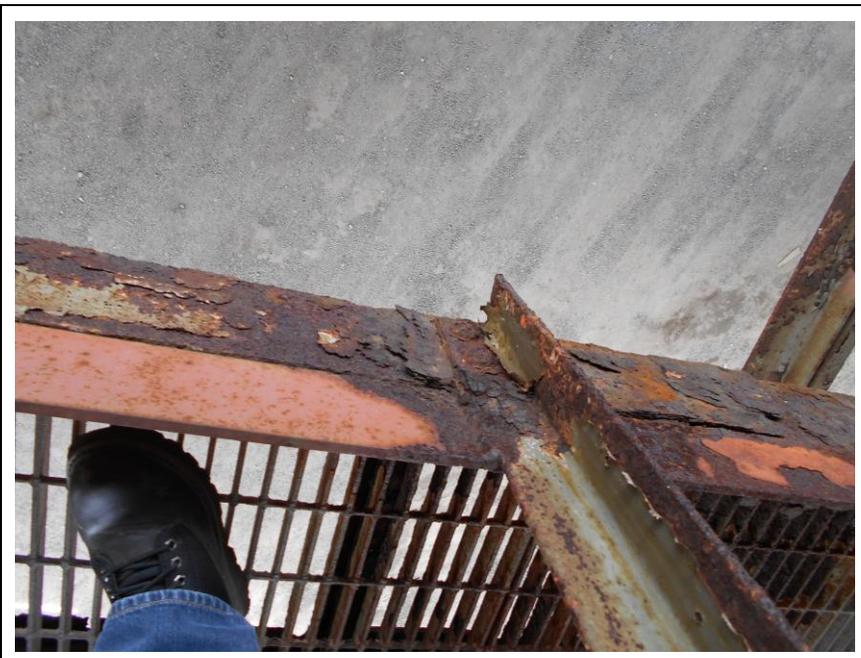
Bridge No. 00571A, Lattice Member and Cross Bracing Section Losses.
